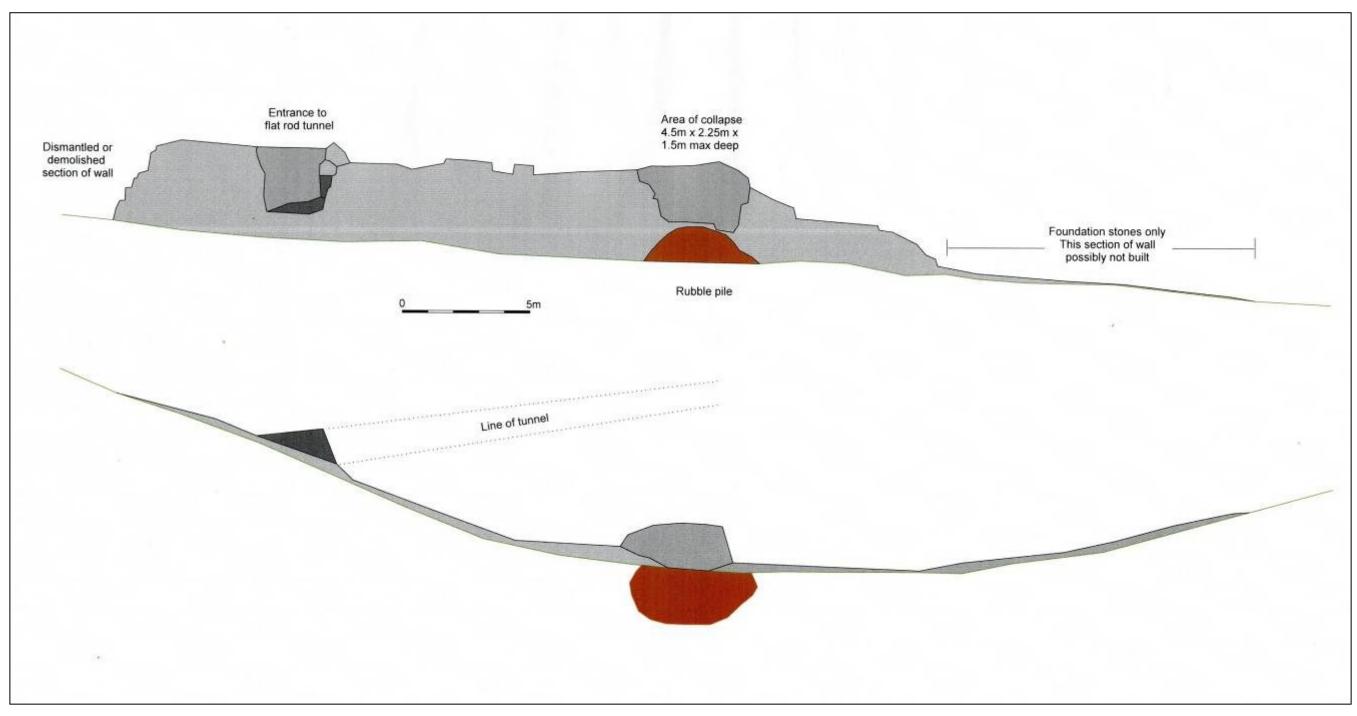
Elevation (top) and plan (bottom) of the Wheal Call dressing floor retaining wall, showing the entrance to and route of the flatrod tunnel (left), the recently collapsed section of facing (centre) and the section which never appears to have been completed, although foundation stones were laid.
